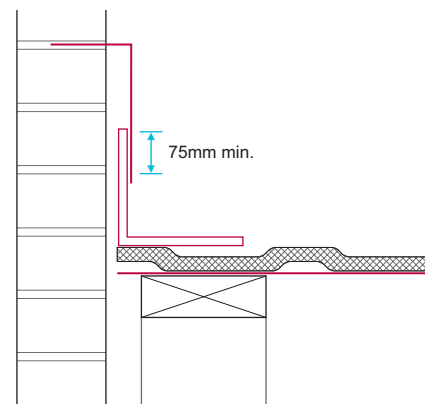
Timber frame interface with concrete or masonry communal areas – before movement
